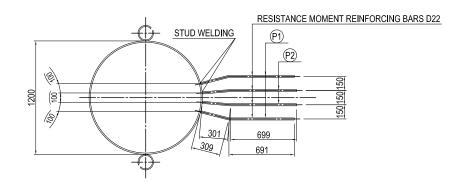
DETAIL OF CONNECTION BETWEEN STEEL PIPE SHEET PILE AND FOOTING OF P17 PIER
